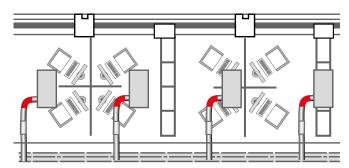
Installation example. Straight air connection, alternative with 90° bend.
